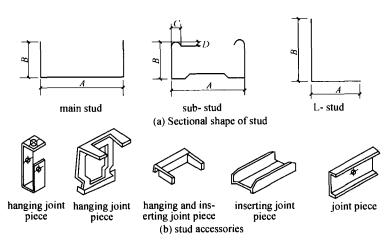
Suspended Ceiling Galvanized Steel Stud
